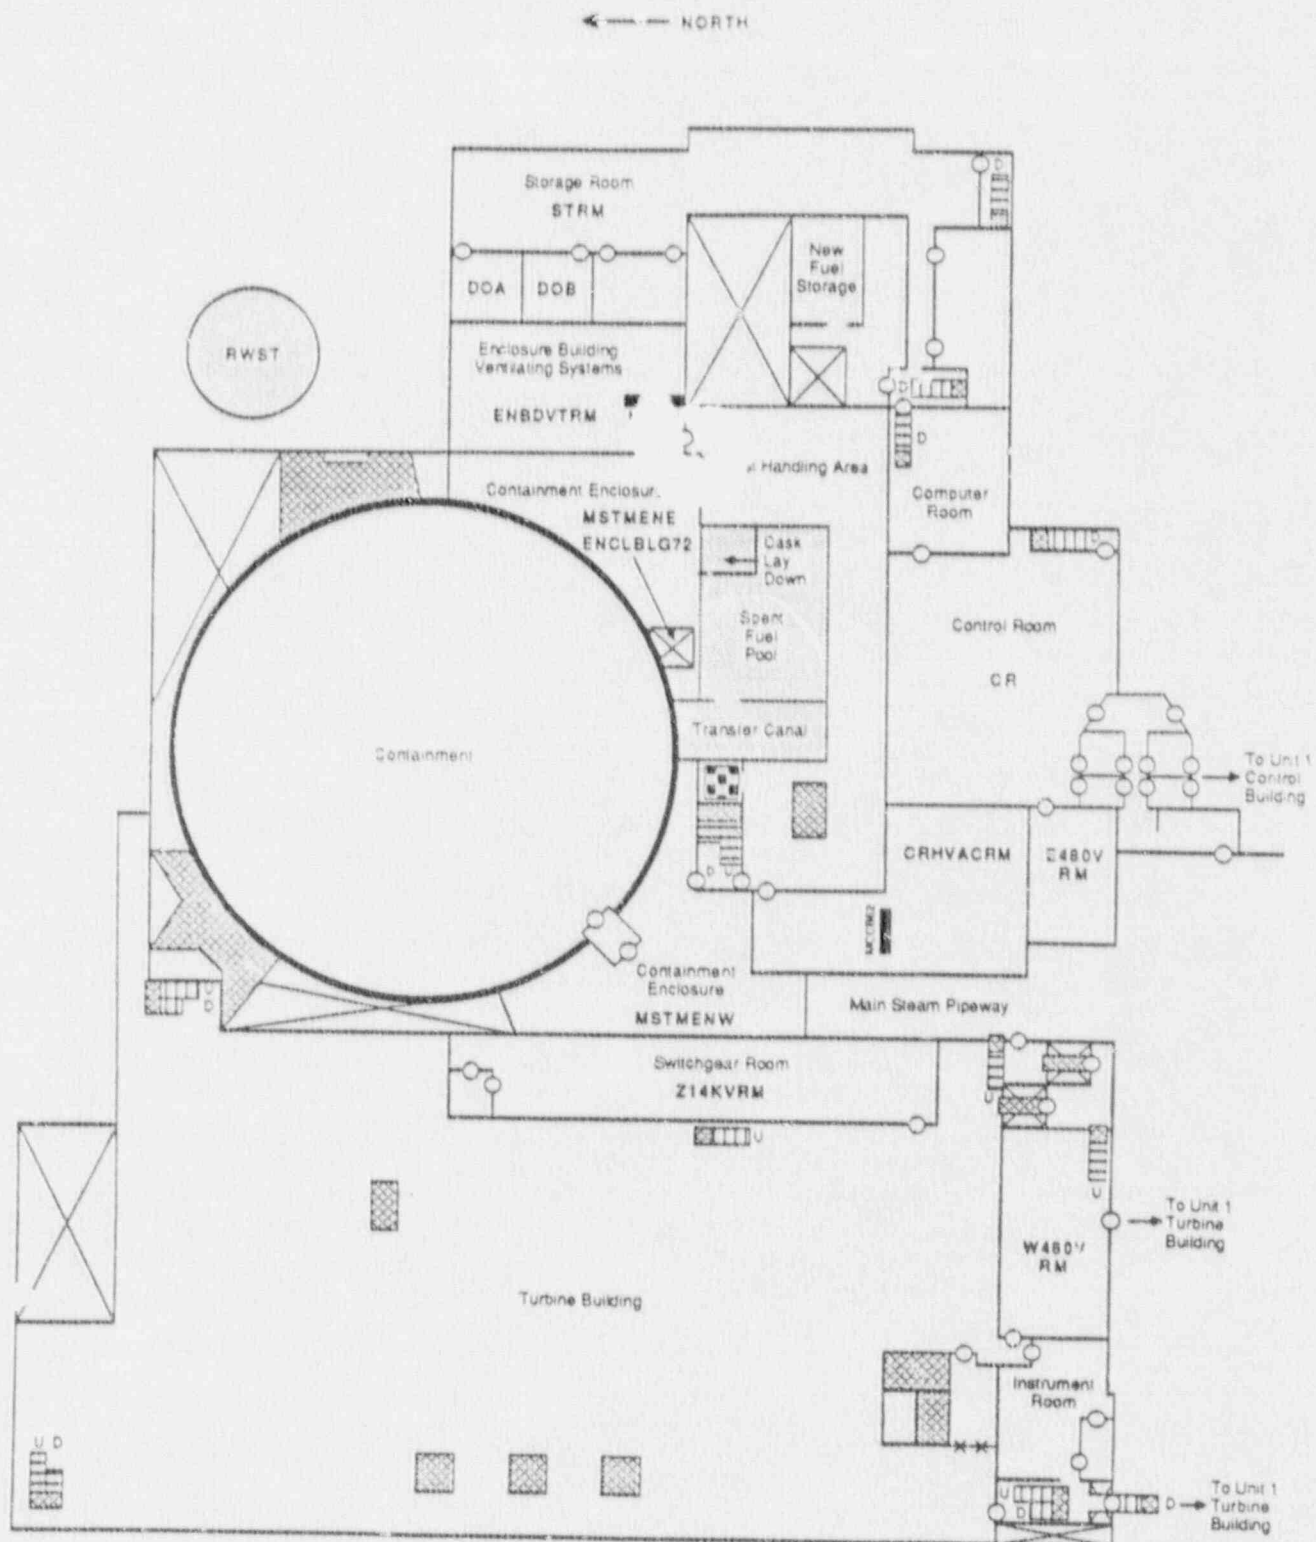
Millstone 2 Containment and Auxiliary Buildings, Elevation 38' 6", and Turbine Building, Elevation 31' 6"
